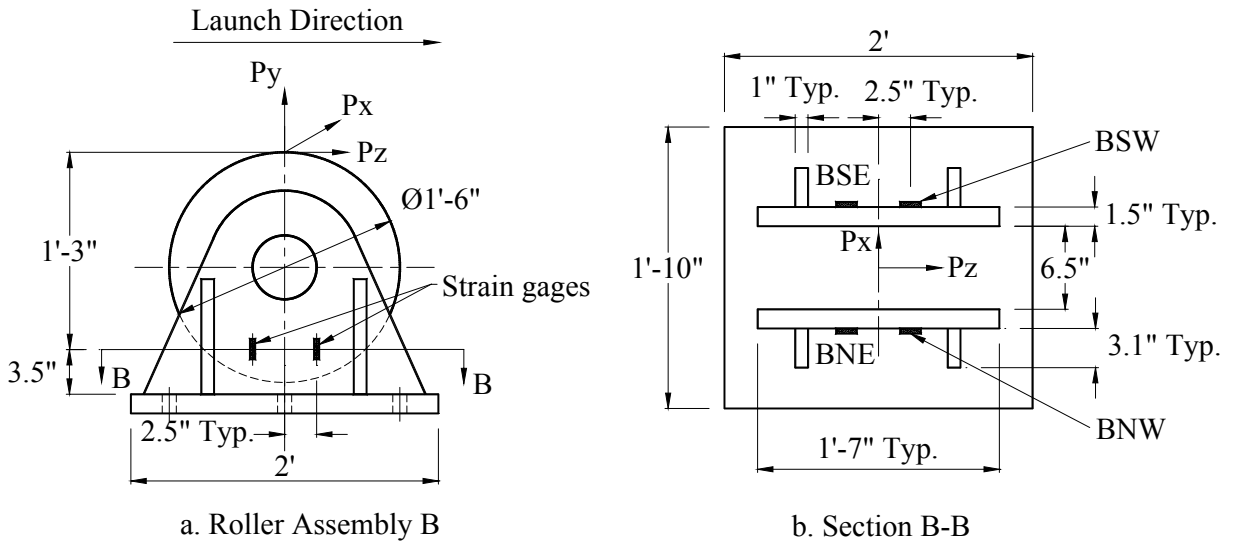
Instrumentation of rollers B and C – Launch WB3 and WB4.
